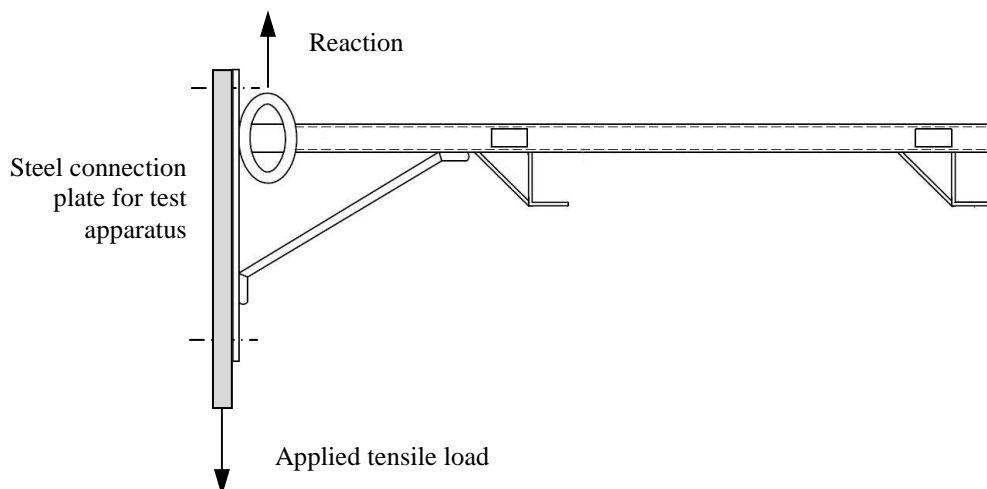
Guardrail Post Safety Loop Tension Test Arrangement
